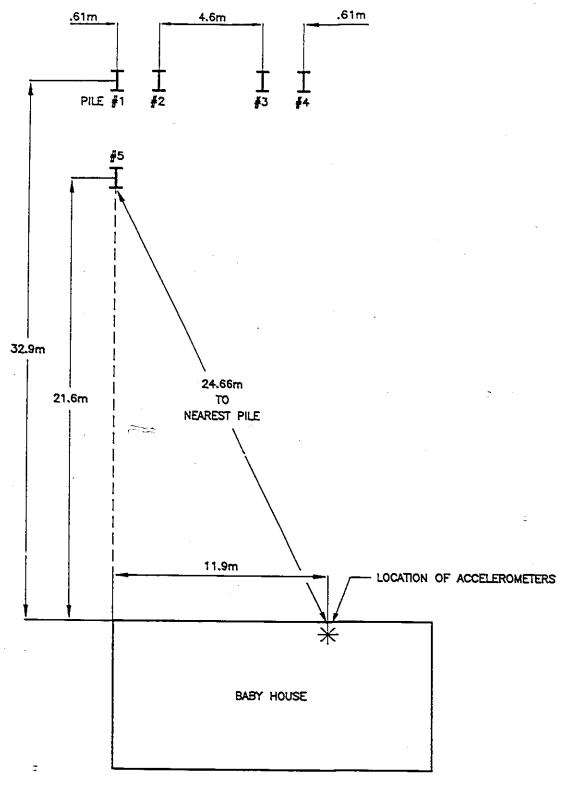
Sketch Showing Baby House and Layout of Piles
